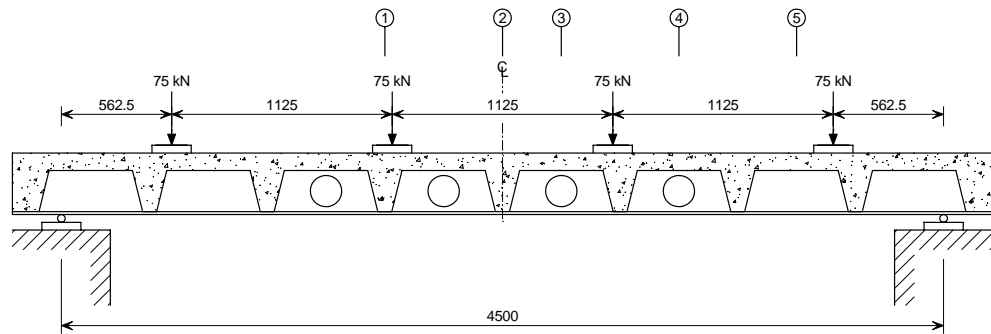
Longitudinal arrangement showing location of hydraulic rams and cross sections instrumented with thermocouples.
